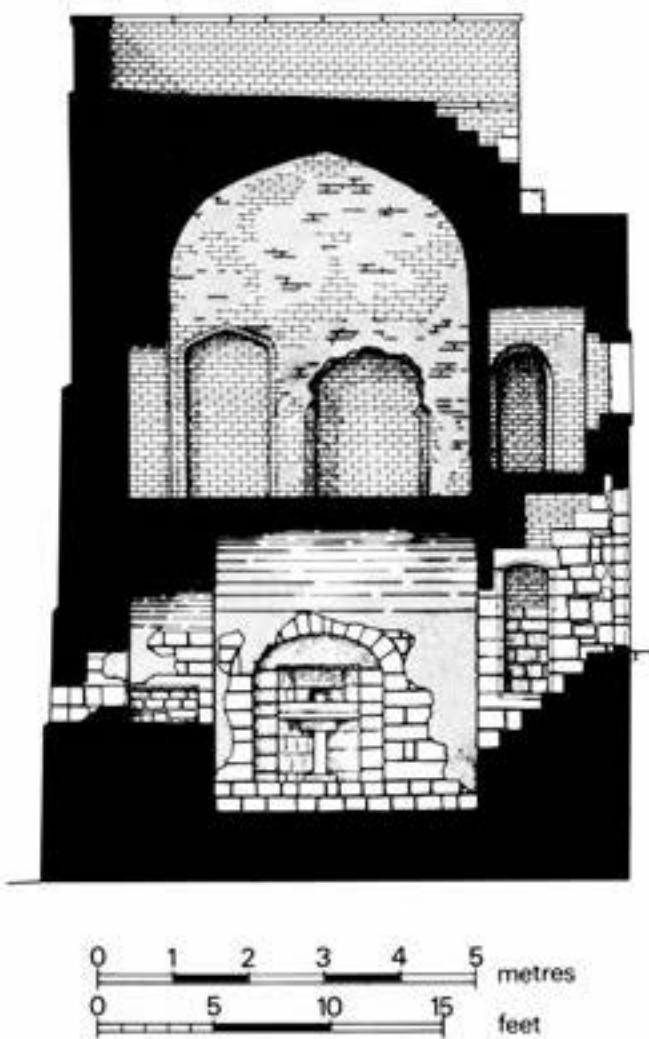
The Tile Tower; internal west-east elevation of the north wall
